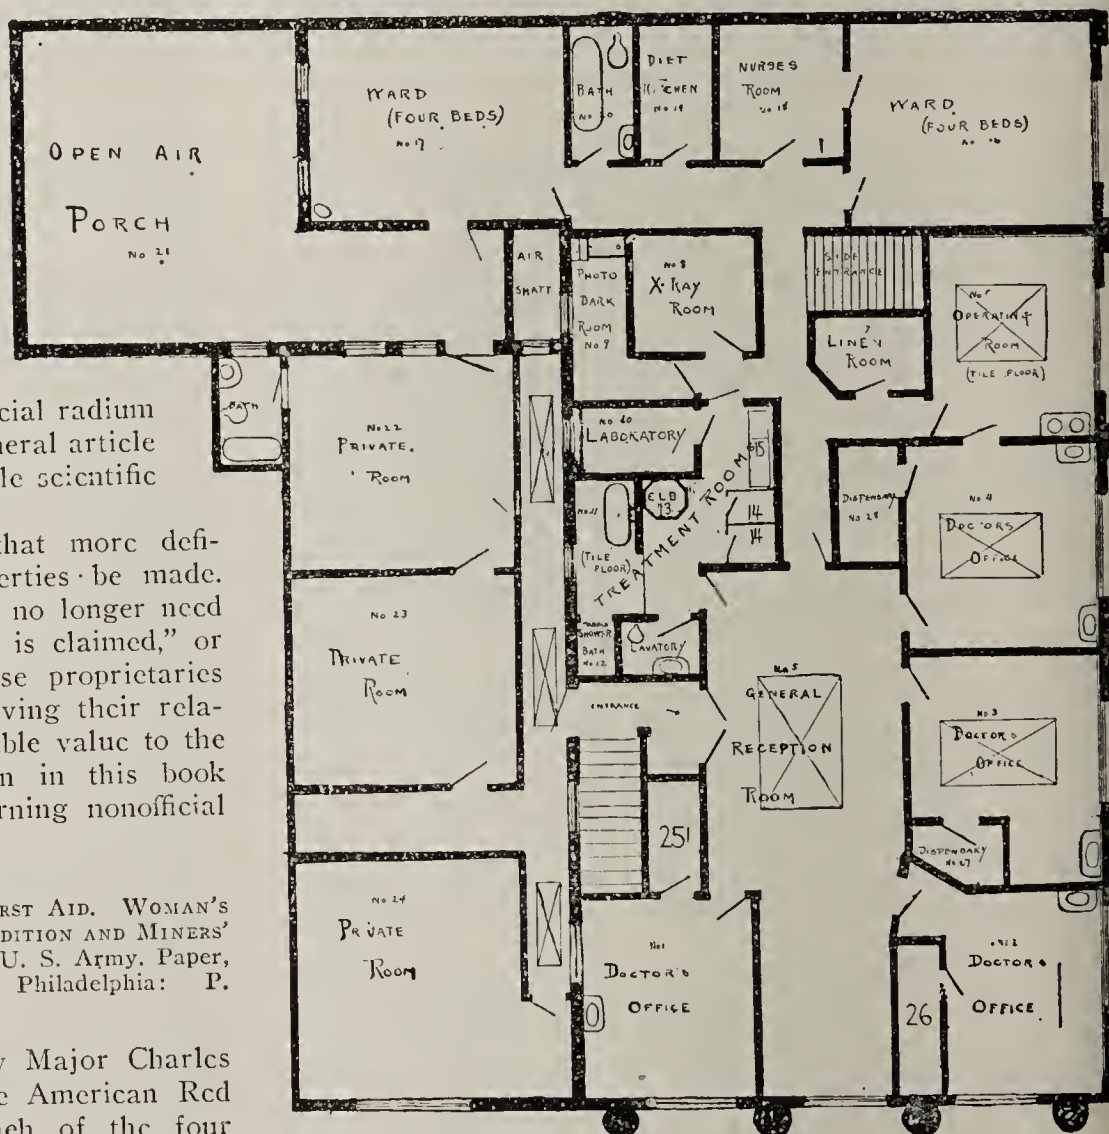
Floor plan; 13, electric light bath; 14, dressing-rooms; 15, massage table; 25 and 26, dispensaries.
